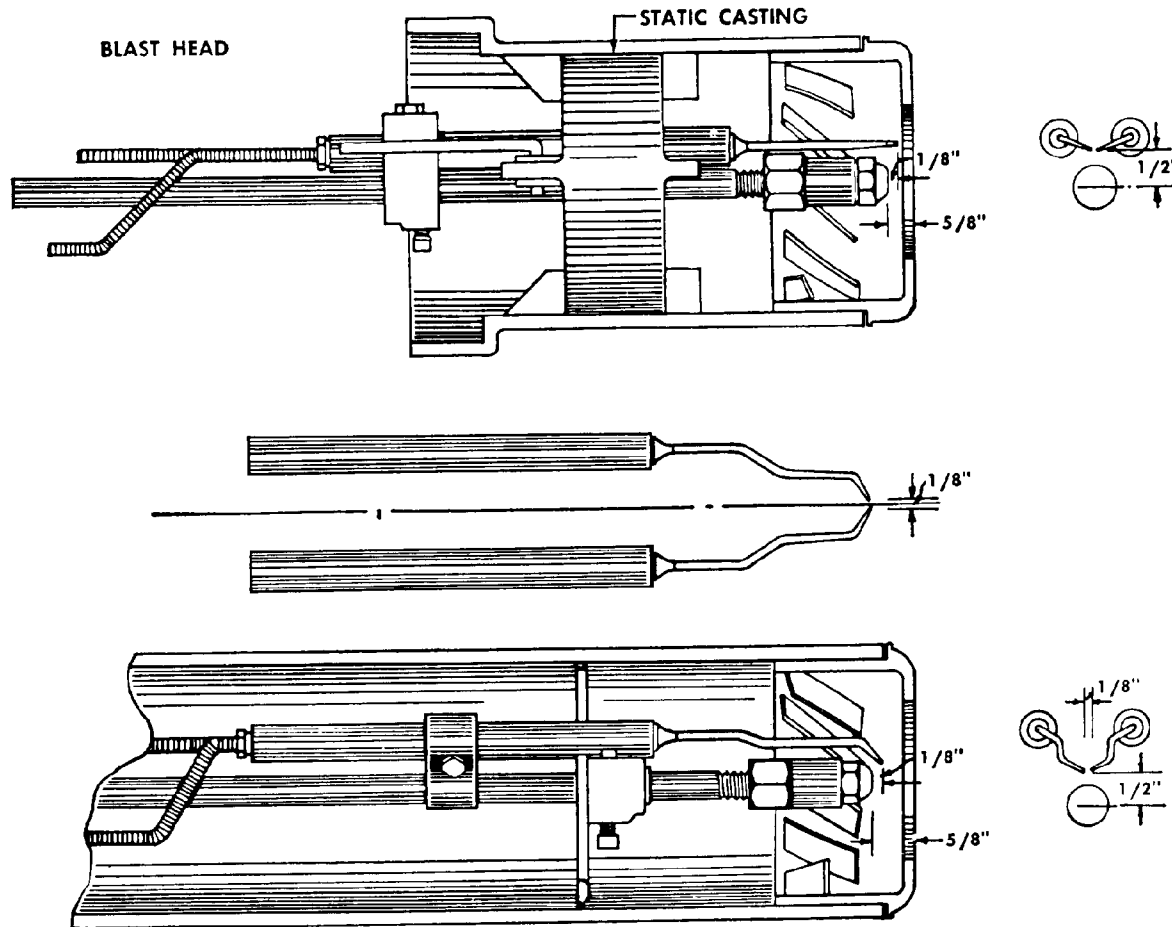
Settings of ignition points and nozzle for oil burner.
